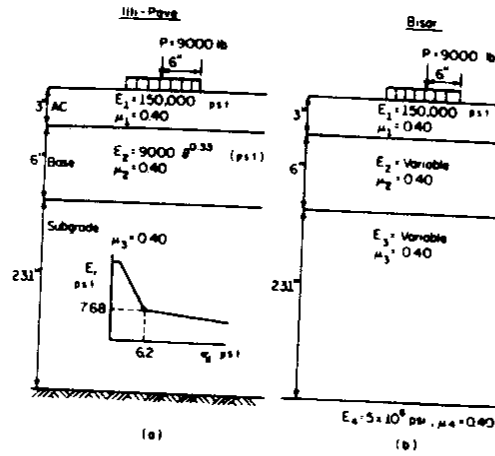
ILLI-PAVE Model: a) Cylindrical Pavement Configuration and b) Rectangular Half Space of an Axisymmetric Solid [after Ref. II-5] [after Reference II-13].
